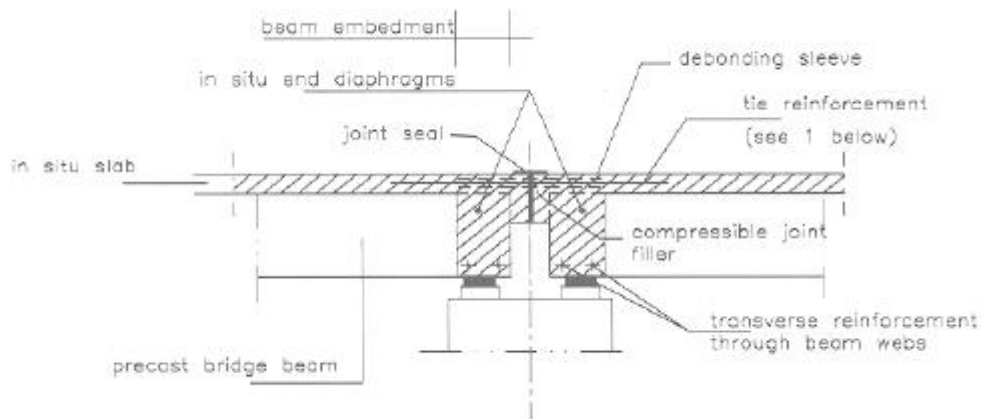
Partial continuity - Detail type 2: Tied deck slab
